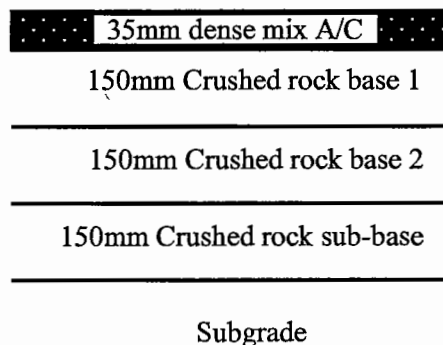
PAVEMENT CONFIGURATION FOR FLAGSTAFF HILL ROAD
